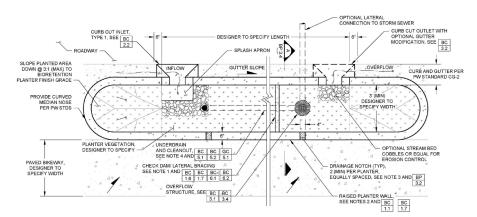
Example Sustainable Street Detail: Bioretention Buffer for Separated Bikeway
